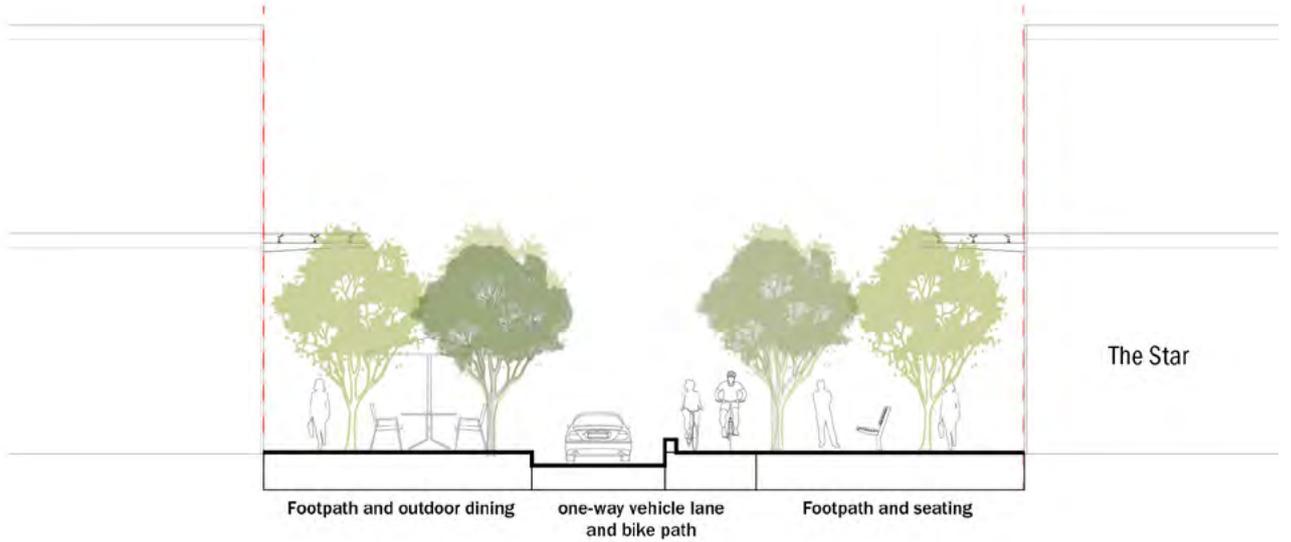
/ Section 02 - Indicative Union Street Central Outcome - One Lane Vehicle Movement
